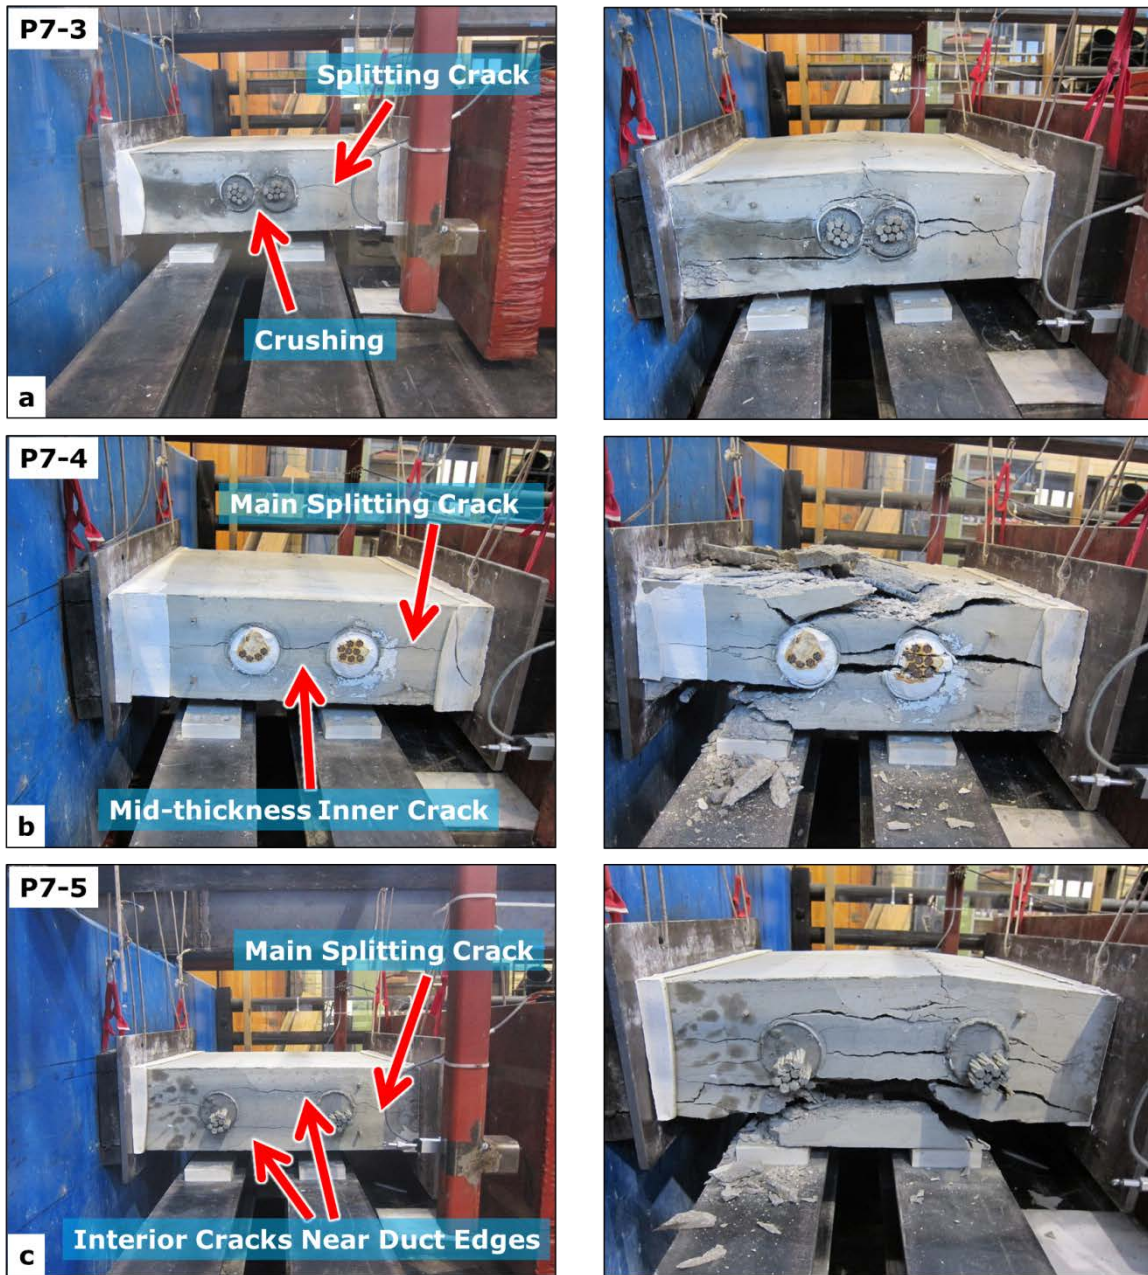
Initial Cracking and Failures of Panels with Multiple Ducts
